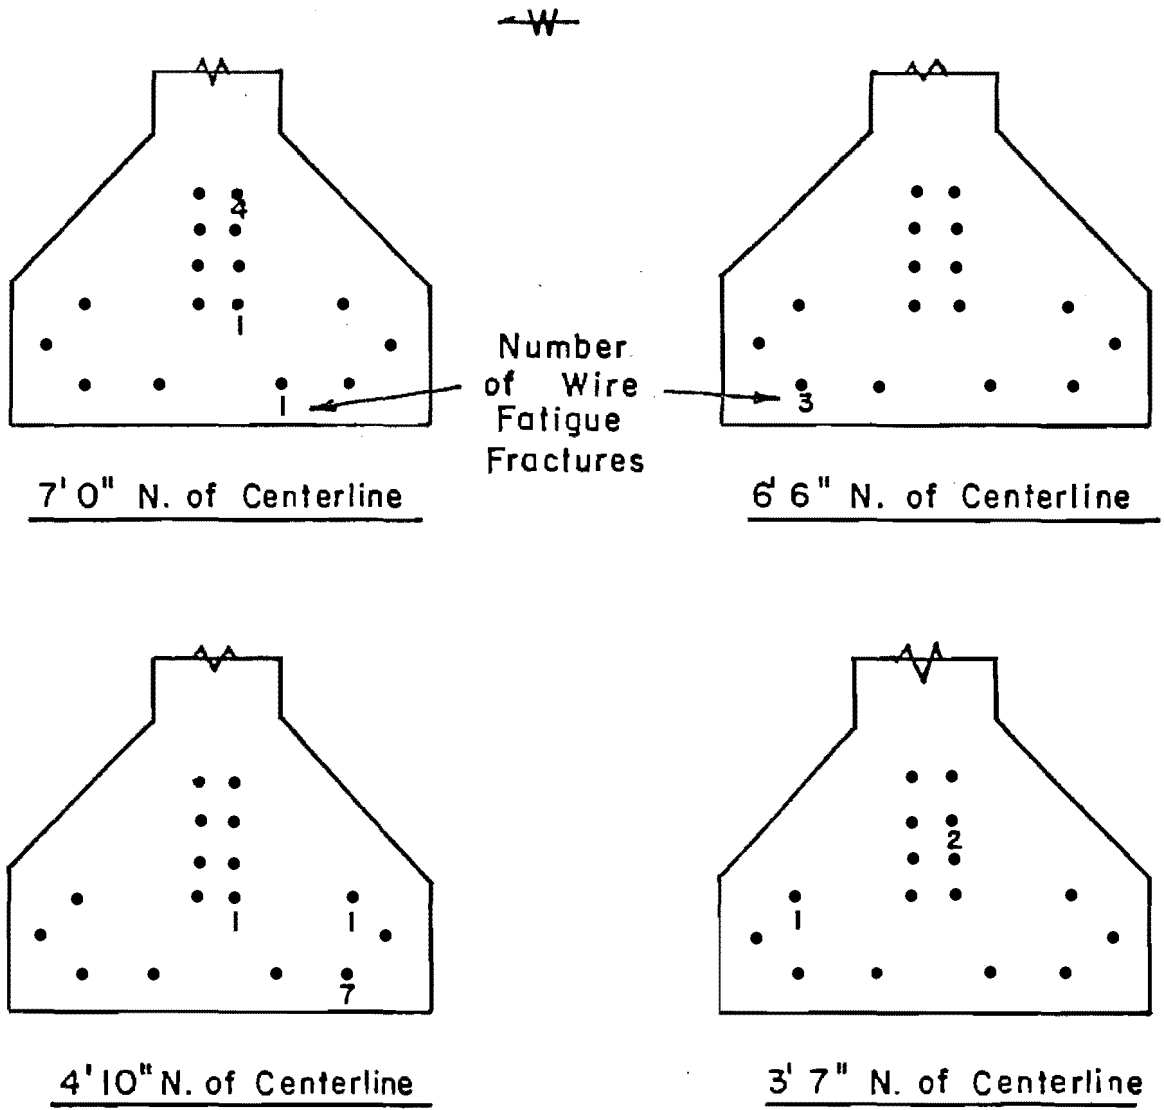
Fatigue fracture locations for Specimen C-16-NP-10.1-NO-0.91
